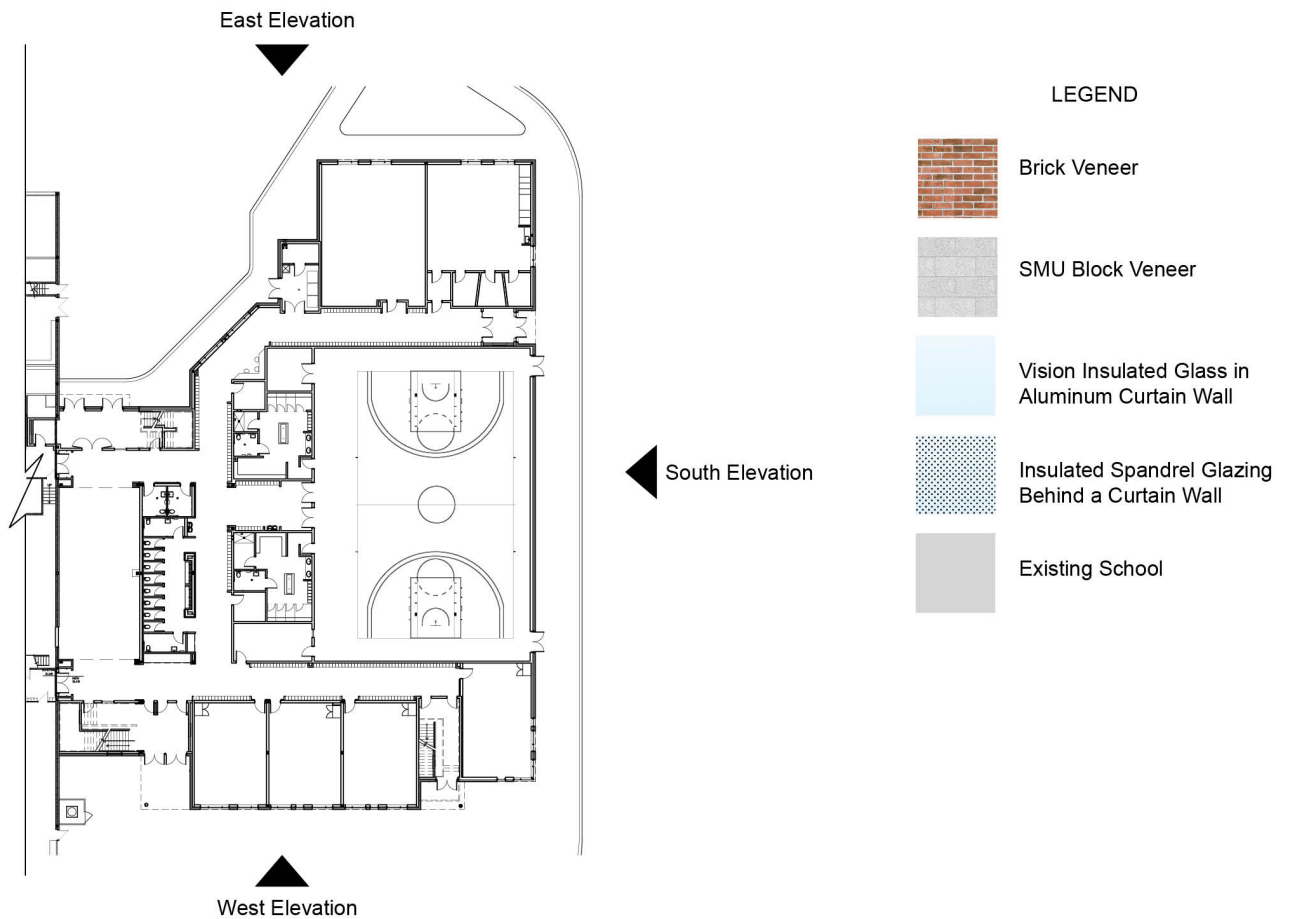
Elevations and ground floor plan of the proposed school addition
